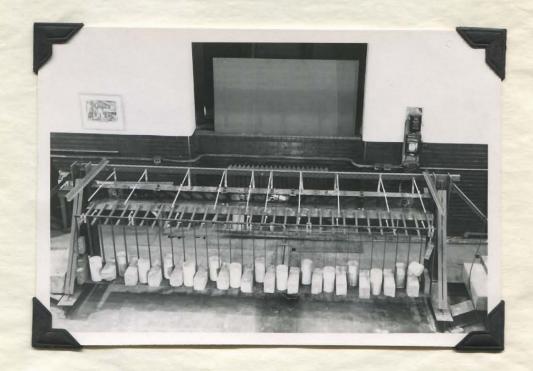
PHOTO II. Overall front view showing four stiffeners on beam, and 100 pounds per foot load on pan at an eccentricity of 23 inches.
